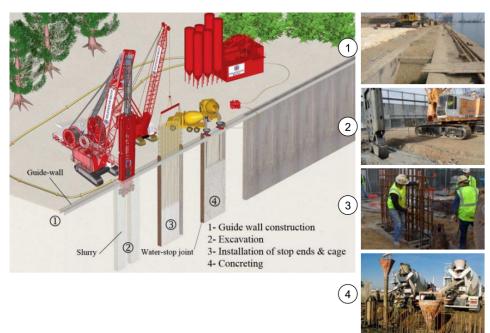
Construction of diaphragm wall (from railsystem.net)
